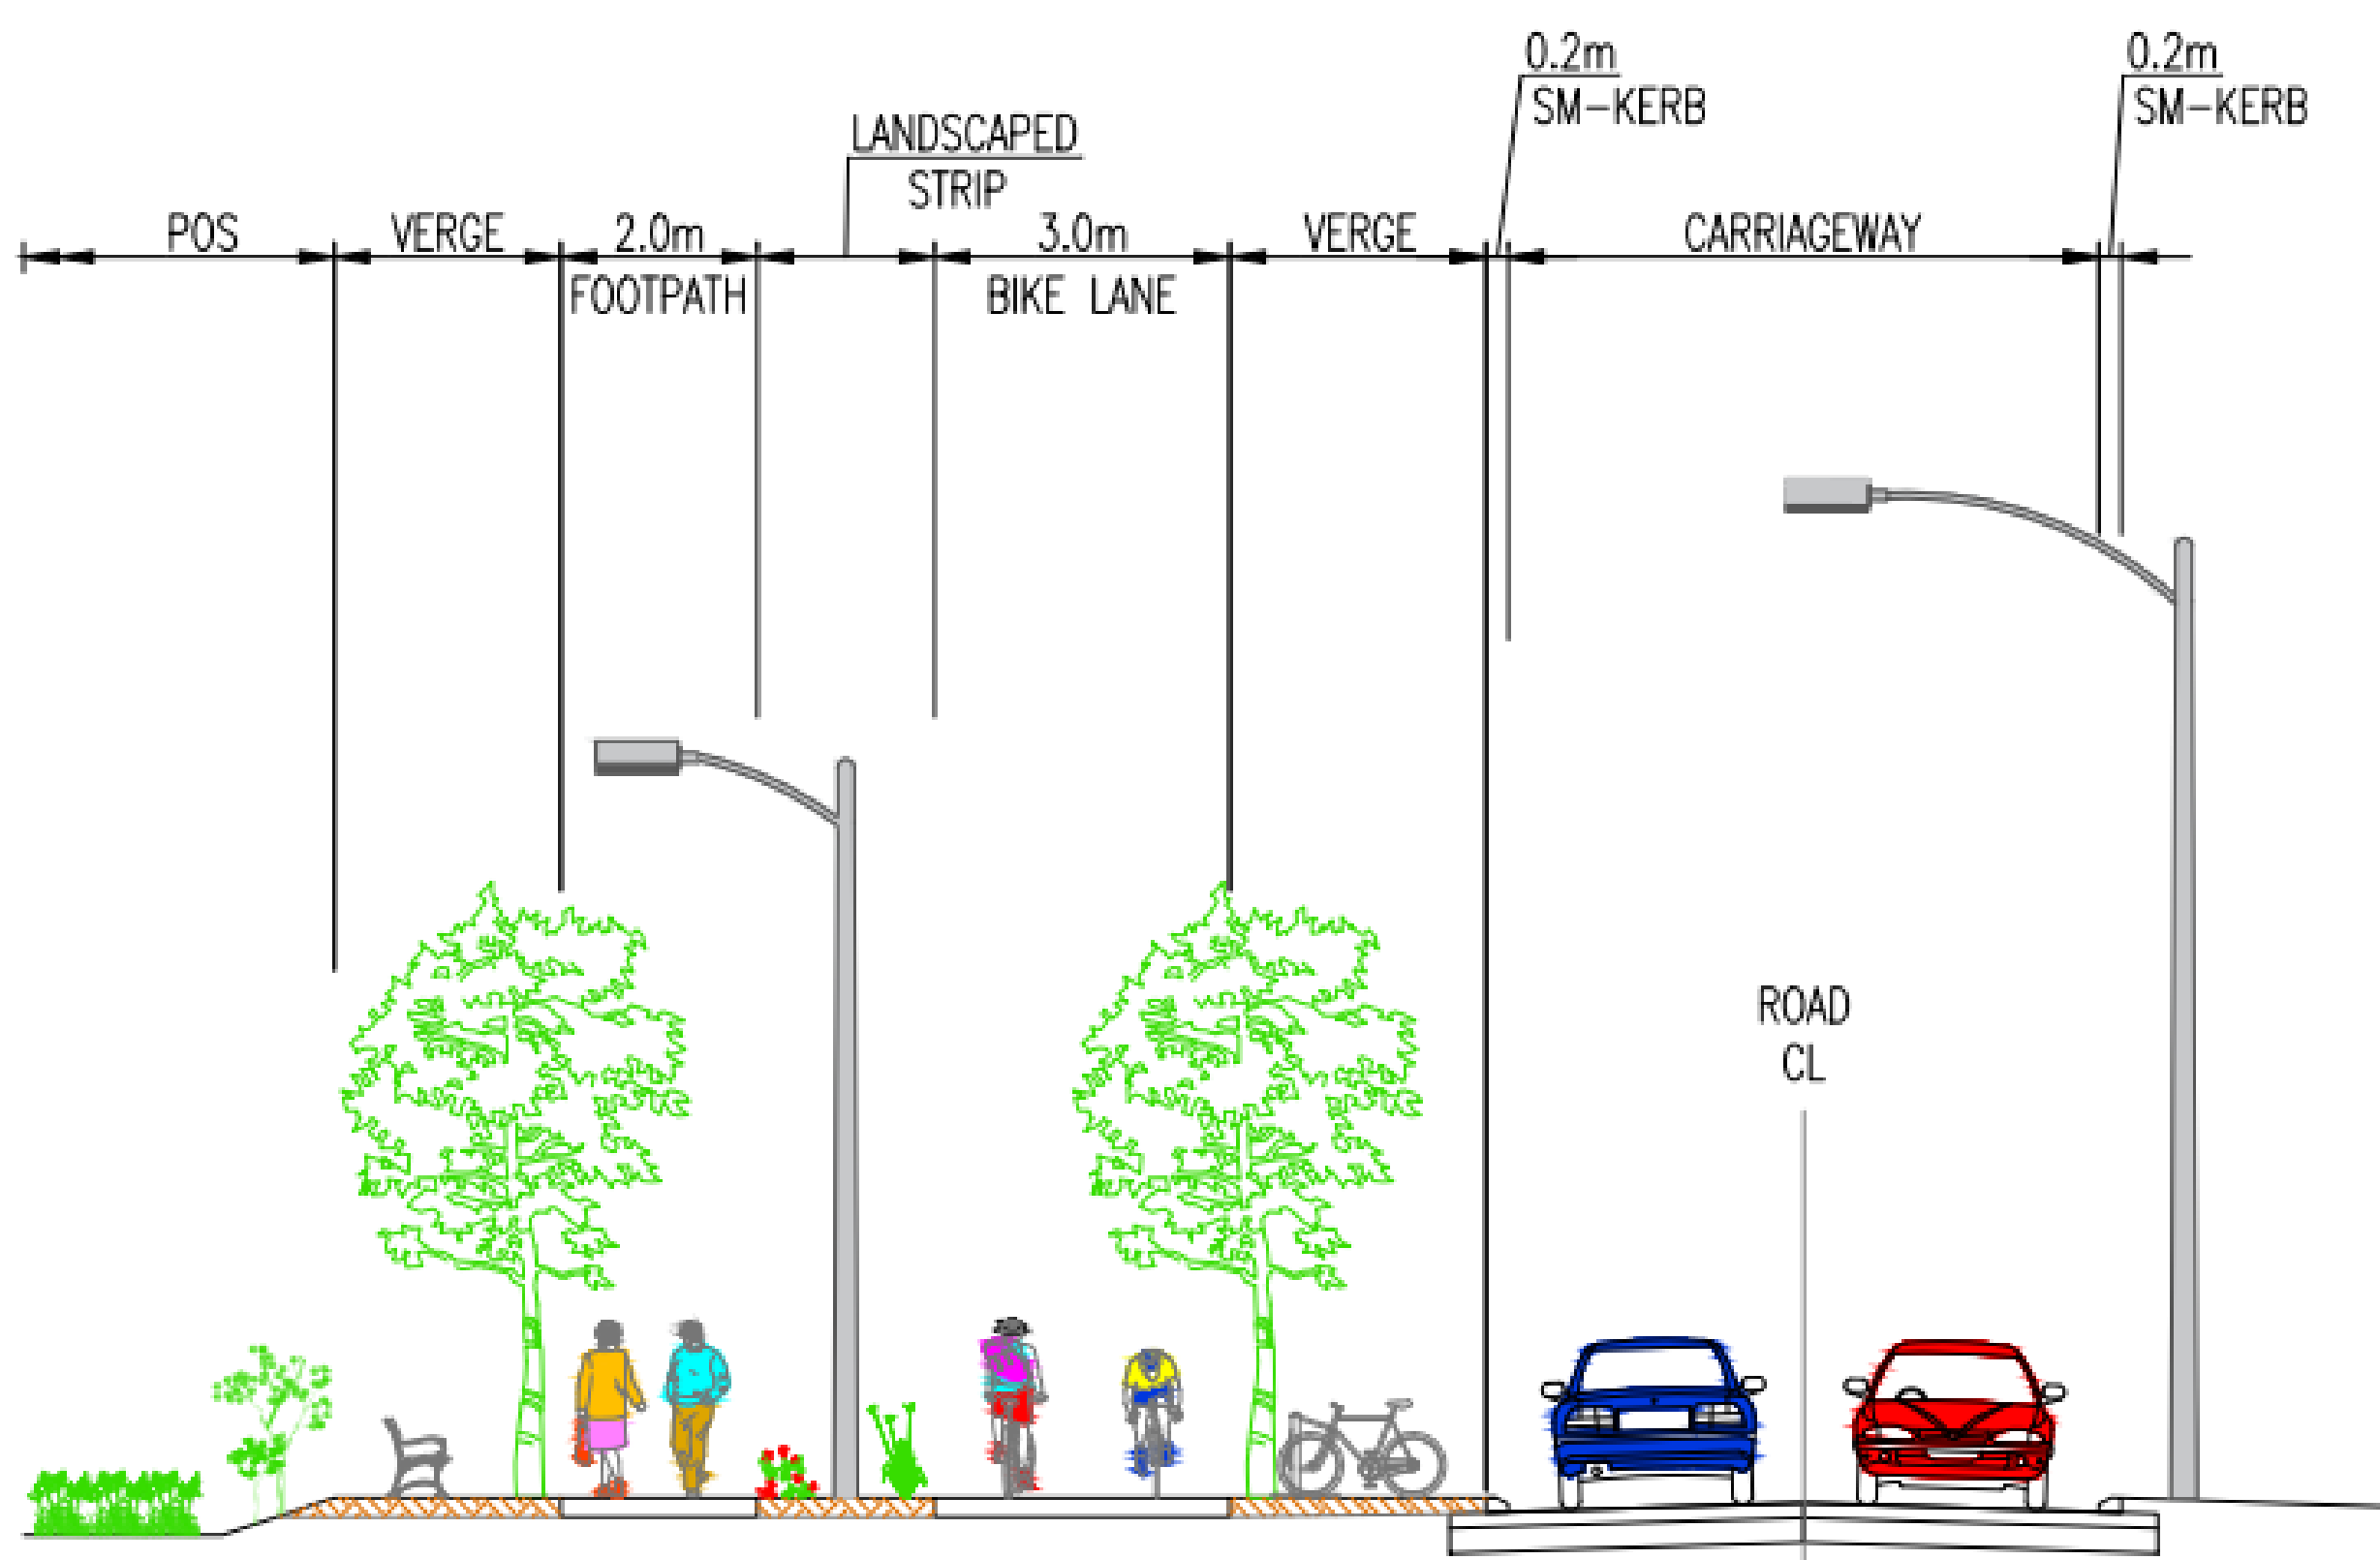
CROSS SECTION LINK ADJOINING POS AND A ROAD
